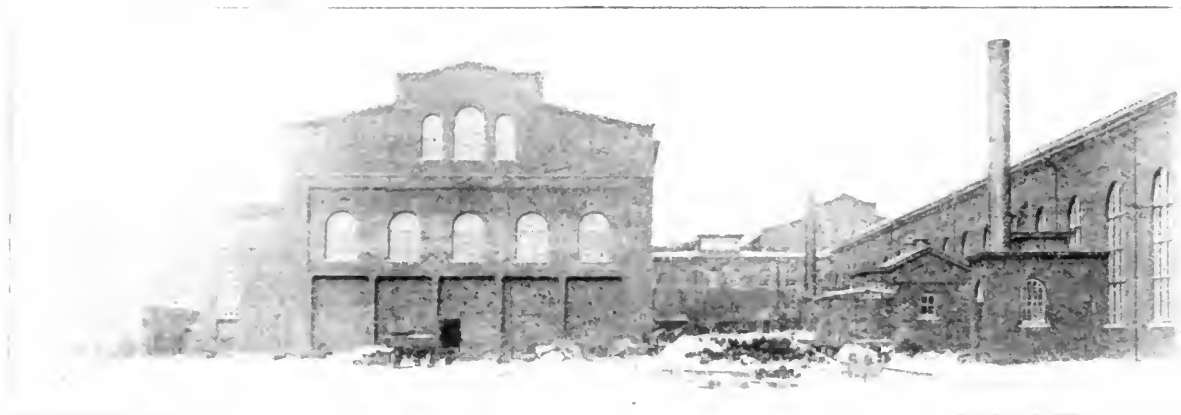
VIEW OF BUILDING, VIEW TO LEFT, THE LEFT LOGGING SHED DOORS TO THE LAMP REPAIR TRACKS. GLASS WALL DOORS TO THE SE. APPEARS AT THE RIGHT. ALSO SHOWS LAMINATOR AND FURNACE HOUSES AT THE RIGHT.
